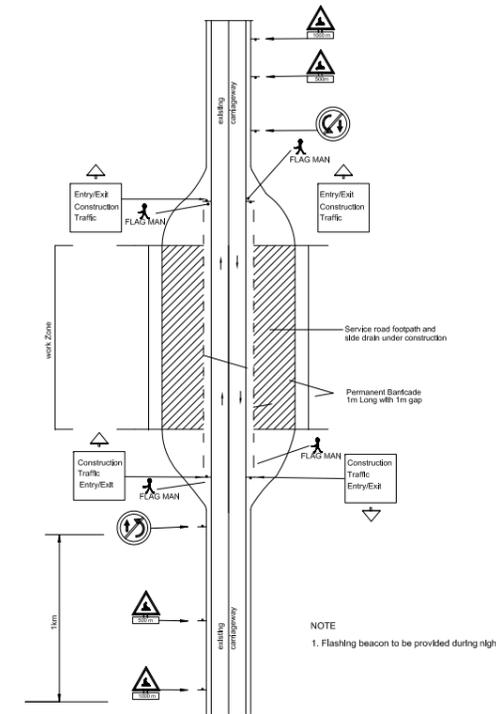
Layout of Traffic Control Devices for Urban Section(Stage - I) Construction of service road, footpath and service drain
